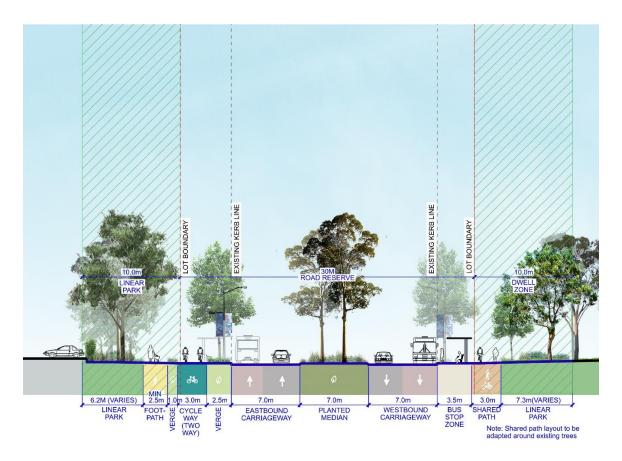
Proposed Waterloo Road Typical Cross-Section
